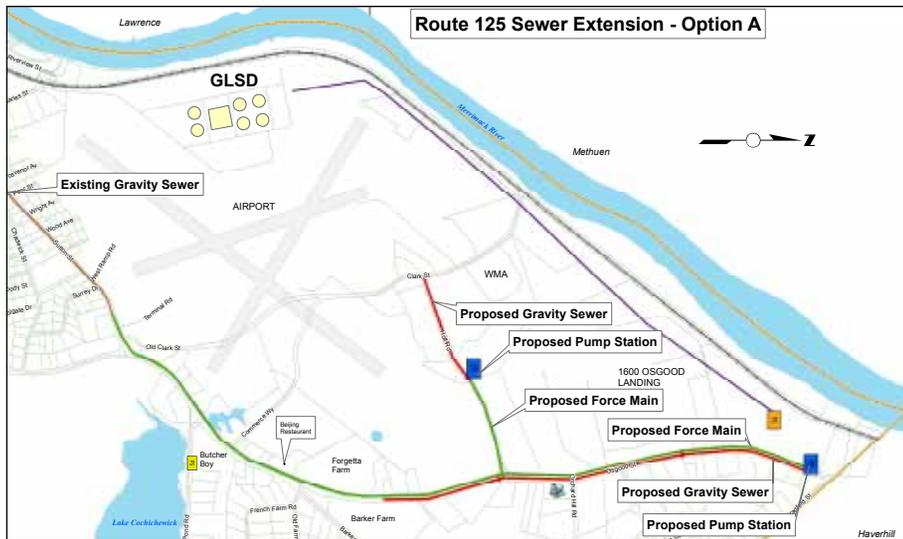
Sewer extension proposal from Sutton Street. Credit: Town of North Andover, 2013.
